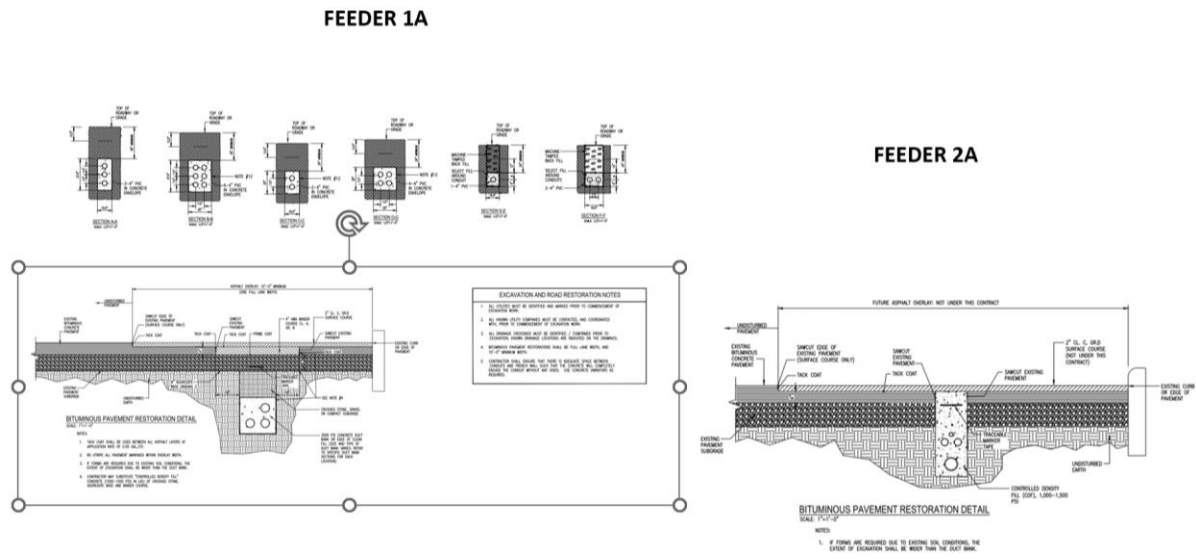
The duct banks that will be installed along the proposed downtown Feeders 1A and 2A Underground Electrical project route.
